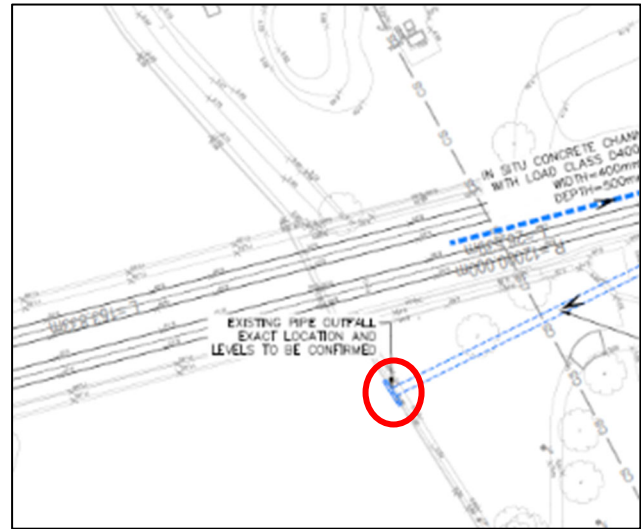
Existing Outfall for Phoenix Park Tunnel Drainage Network
